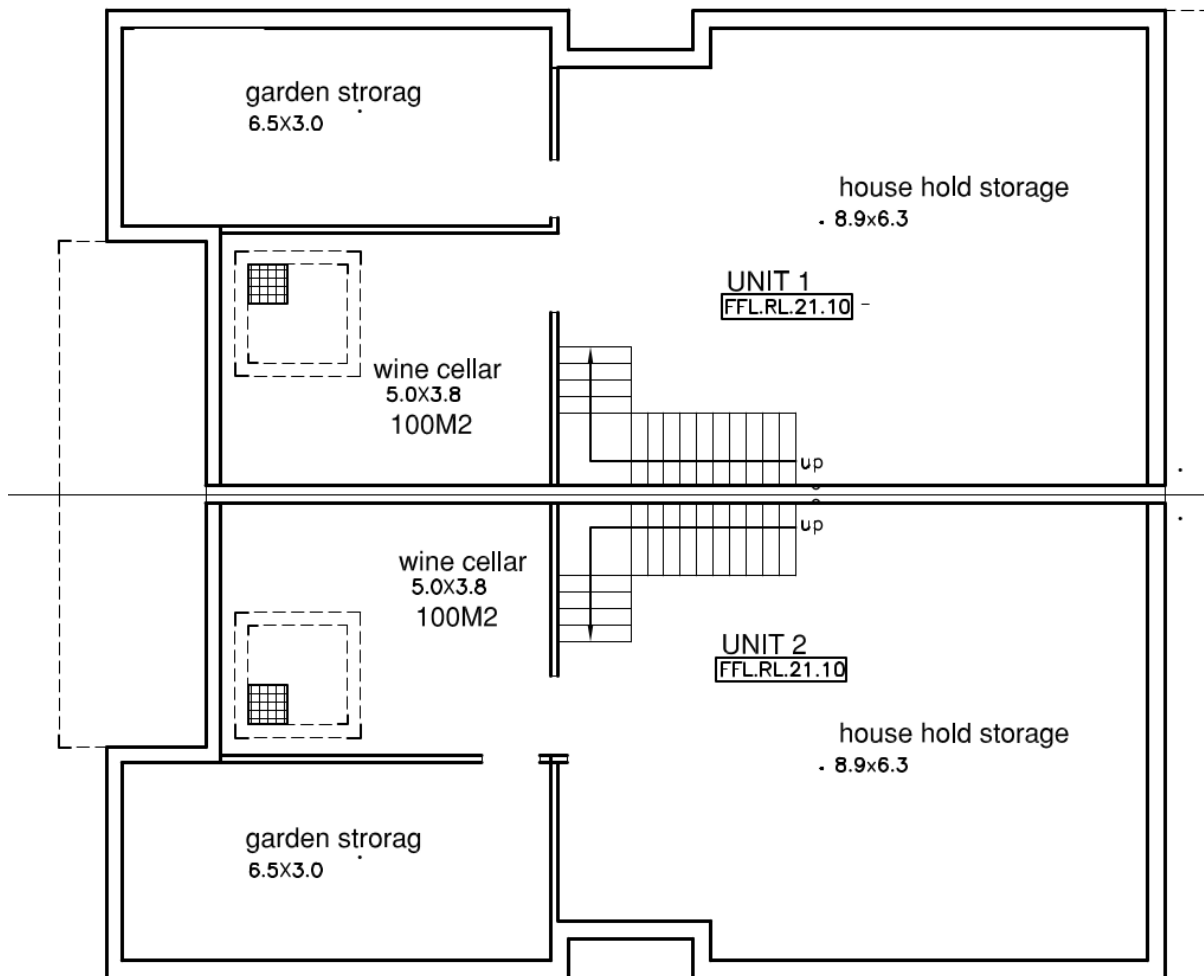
Extract of the proposed basement plan (source: BR Building Service Pty Ltd, dated 18/05/2020)
